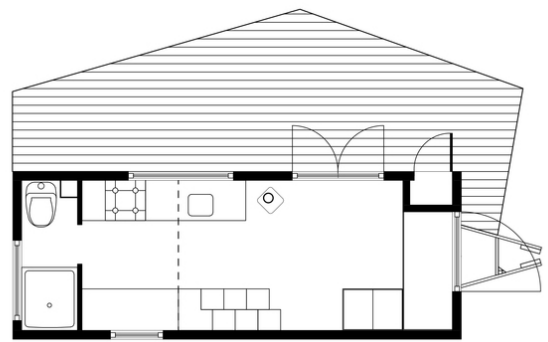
Walden Studio Tiny House, Floorplan (Walden Studio, 2016)
